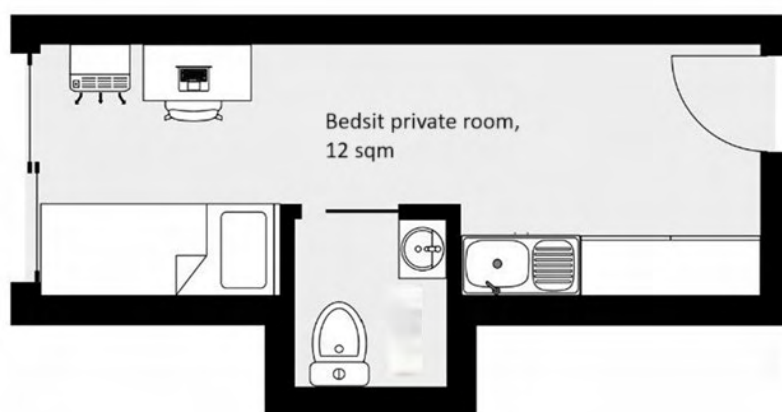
Floor plan of participant 7 who lived in the smallest permissible private boarding house room, at 12m².
